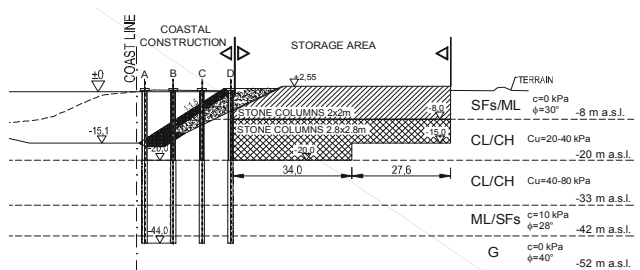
Construction phase III: undersea excavation and execution of undersea embankment.
